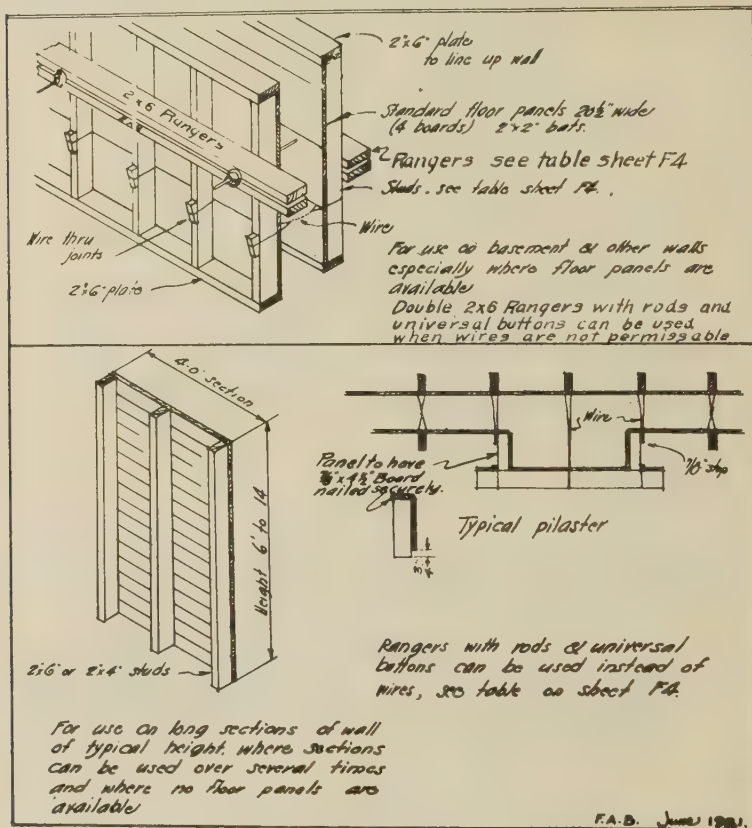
FORMS FOR PILASTERS AND WALLS.
